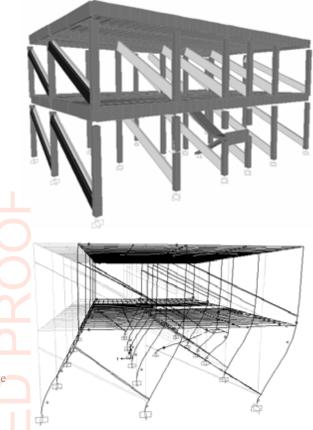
The numerical model of the full scale building: above - geometry; below - column-sway mechanism.
